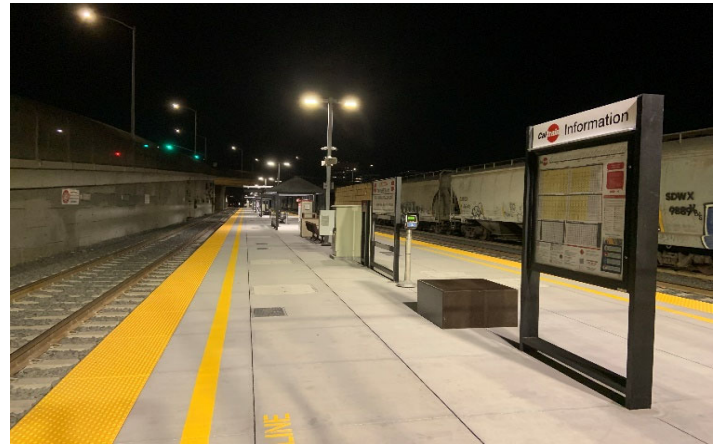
Station Platform South End incl Box Covering PCEP Foundation
